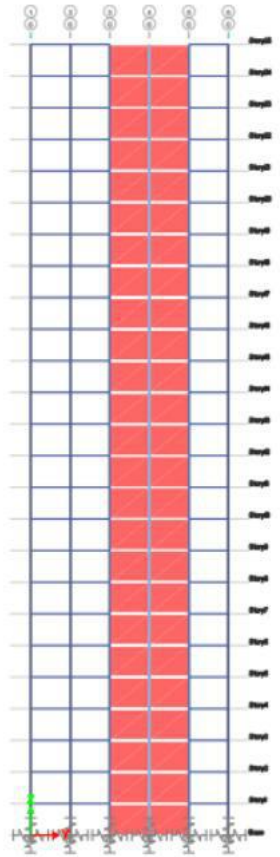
Elevation view of the 3D model showing the SSI foundation and outrigger levels.
